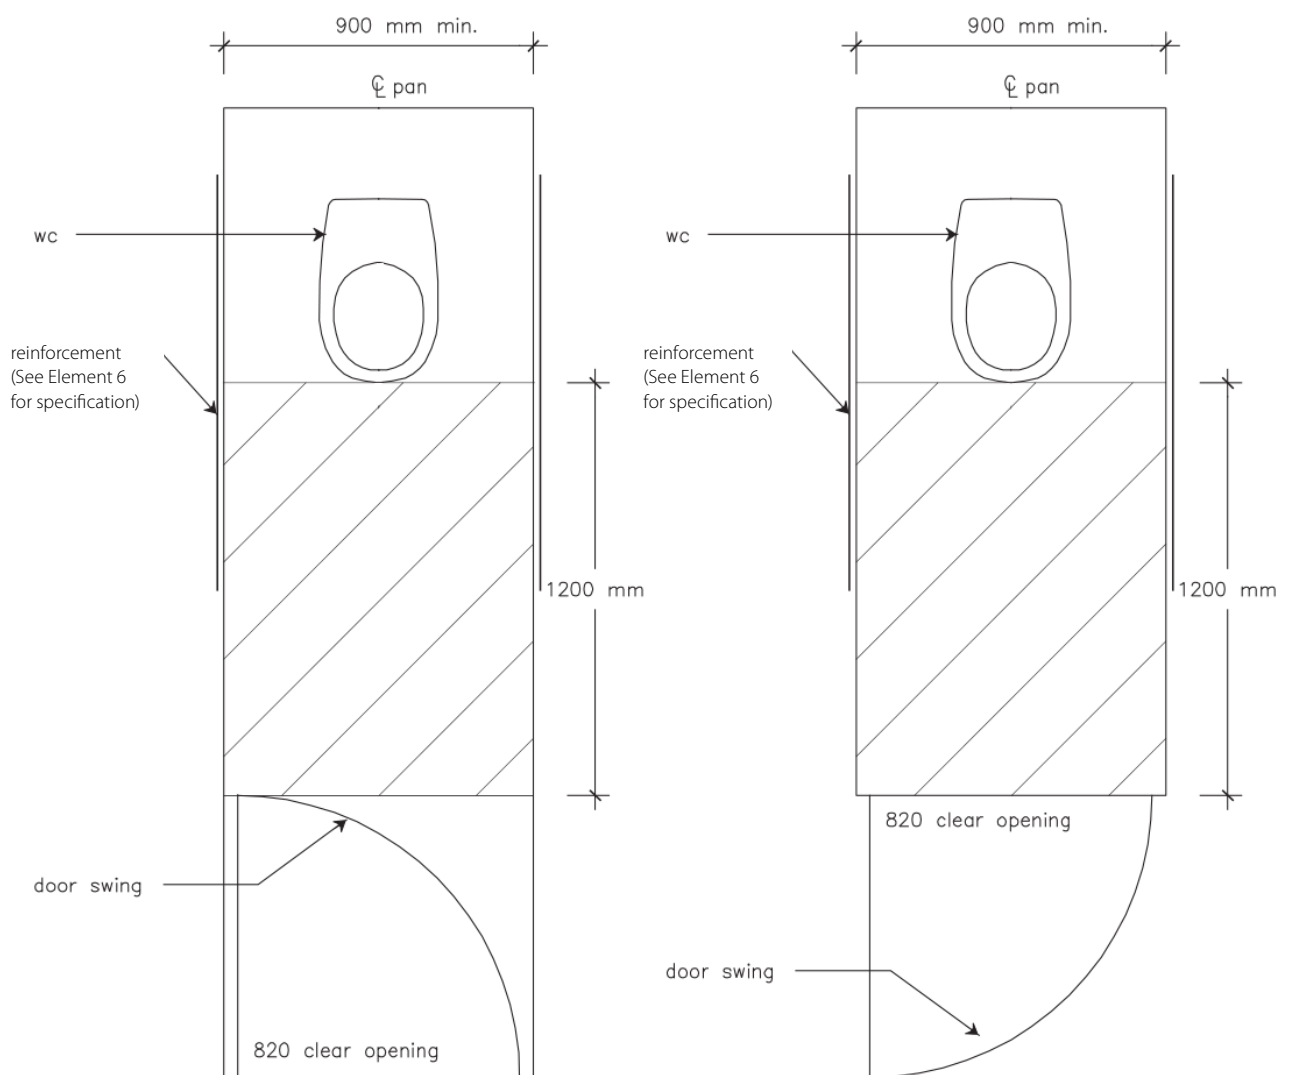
(a) Silver level ground (or entry) level toilet layout and space requirements in a separate room.
